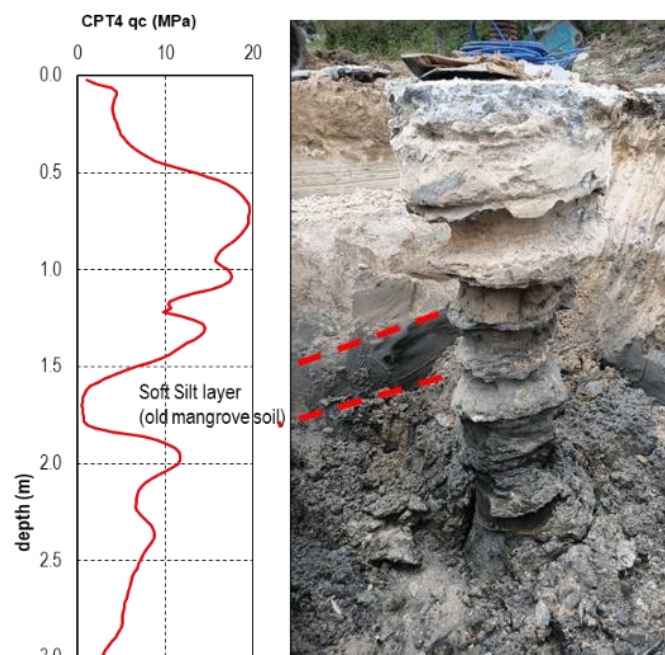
Pile C1 during excavation vs CPT 4 qc profile
